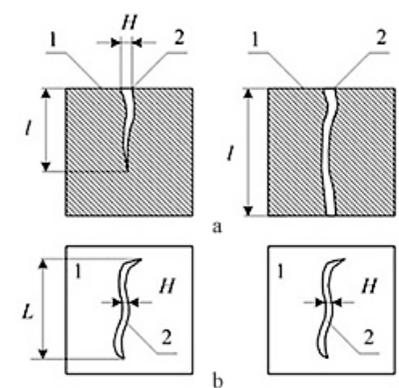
Characteristics of cracks: a) deadlock and through cracks, side view; b) deadlock and through cracks, top view
